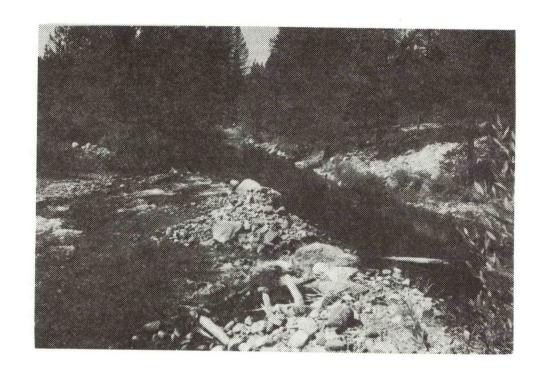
WOOD AND CONCRETE WING DAM USED TO DIVERT WATER INTO IRRIGATION DIVERSIONS. THESE STRUCTURES ARE NOT AS ABUNDANT AS THOSE FOUND IN FIGURE 6.
